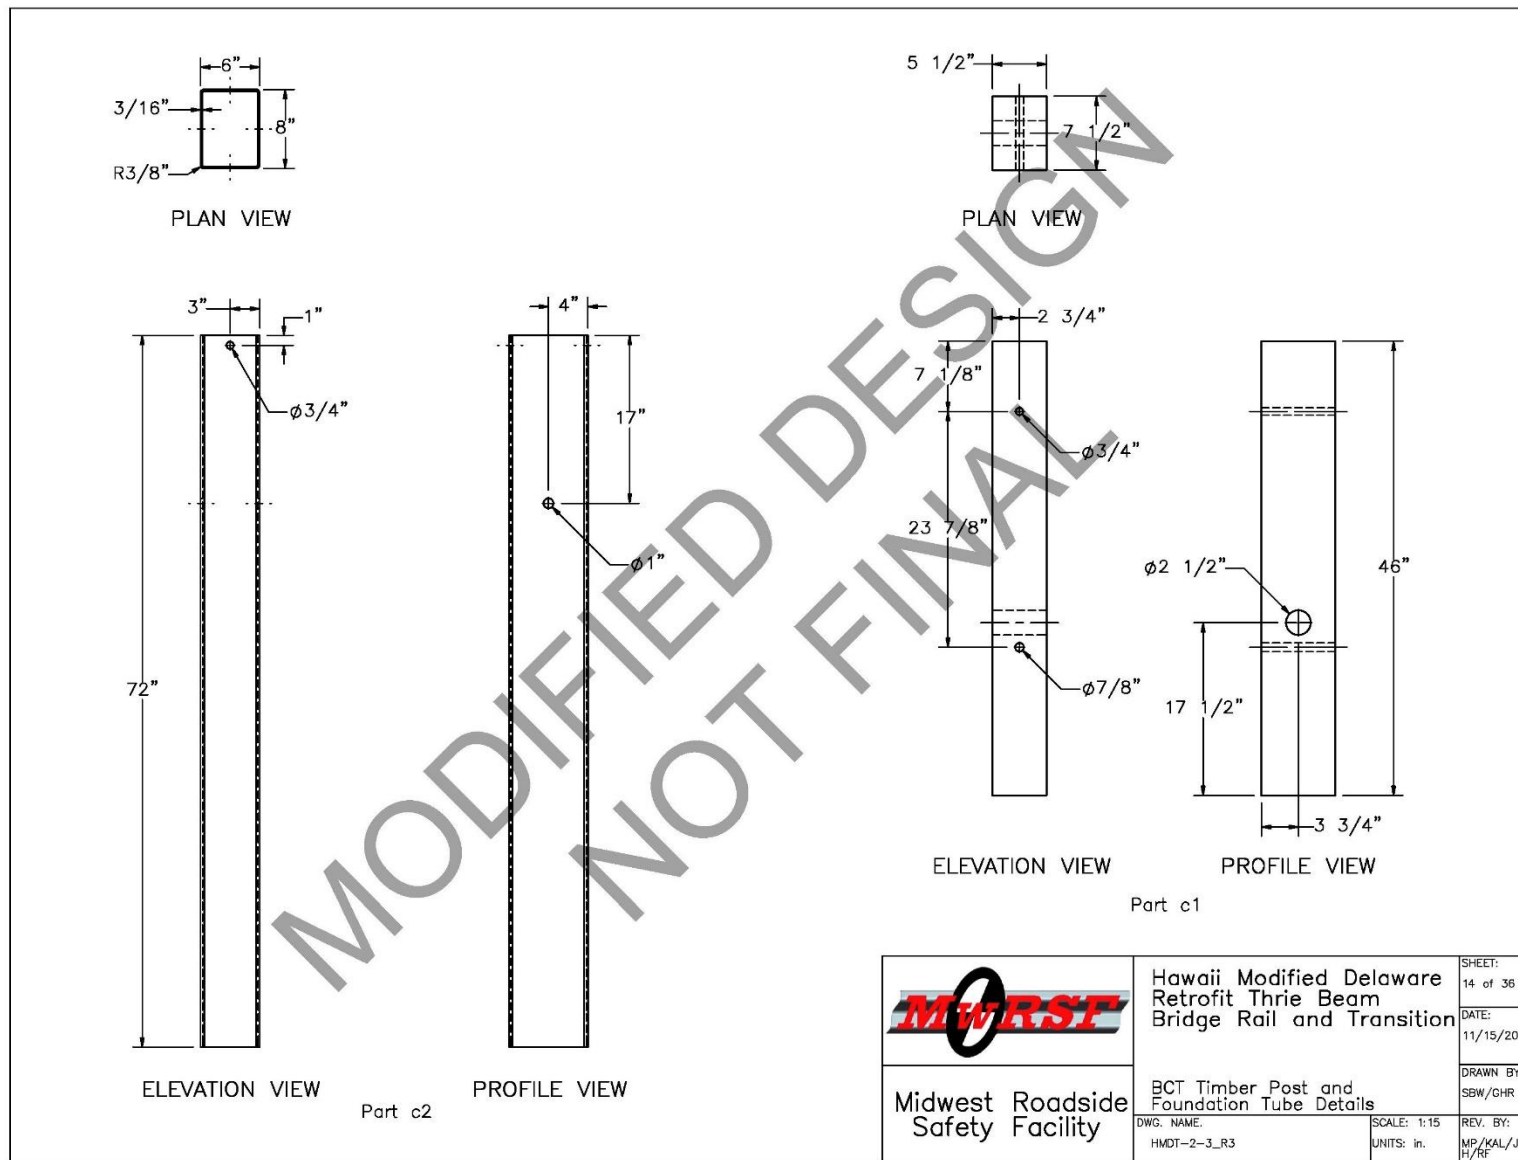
BCT Timber Post and Foundation Tube Details, Test Nos. HMDT-2 and HMDT-3
